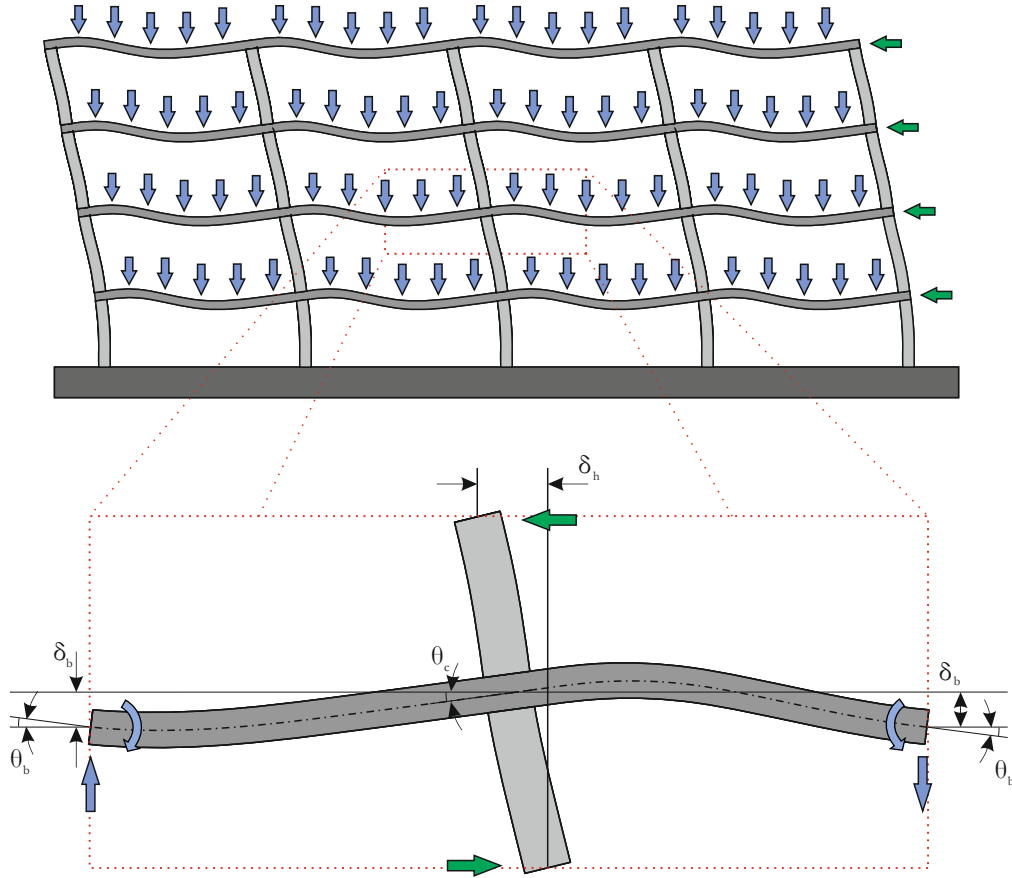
Scheme and detail of a typical flat slab building under vertical and horizontal loading.
